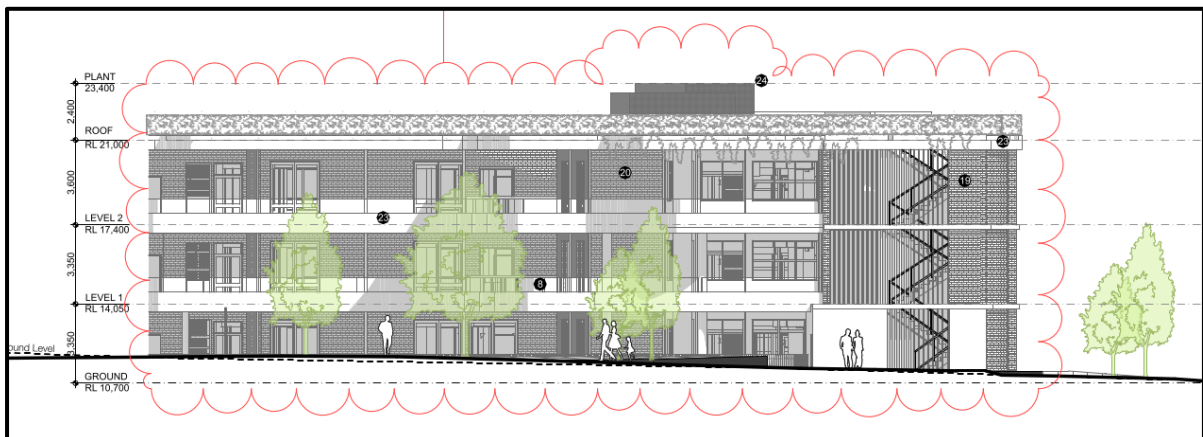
Proposed B10A West Elevation fronting Judd Ave for Subject Modification C
